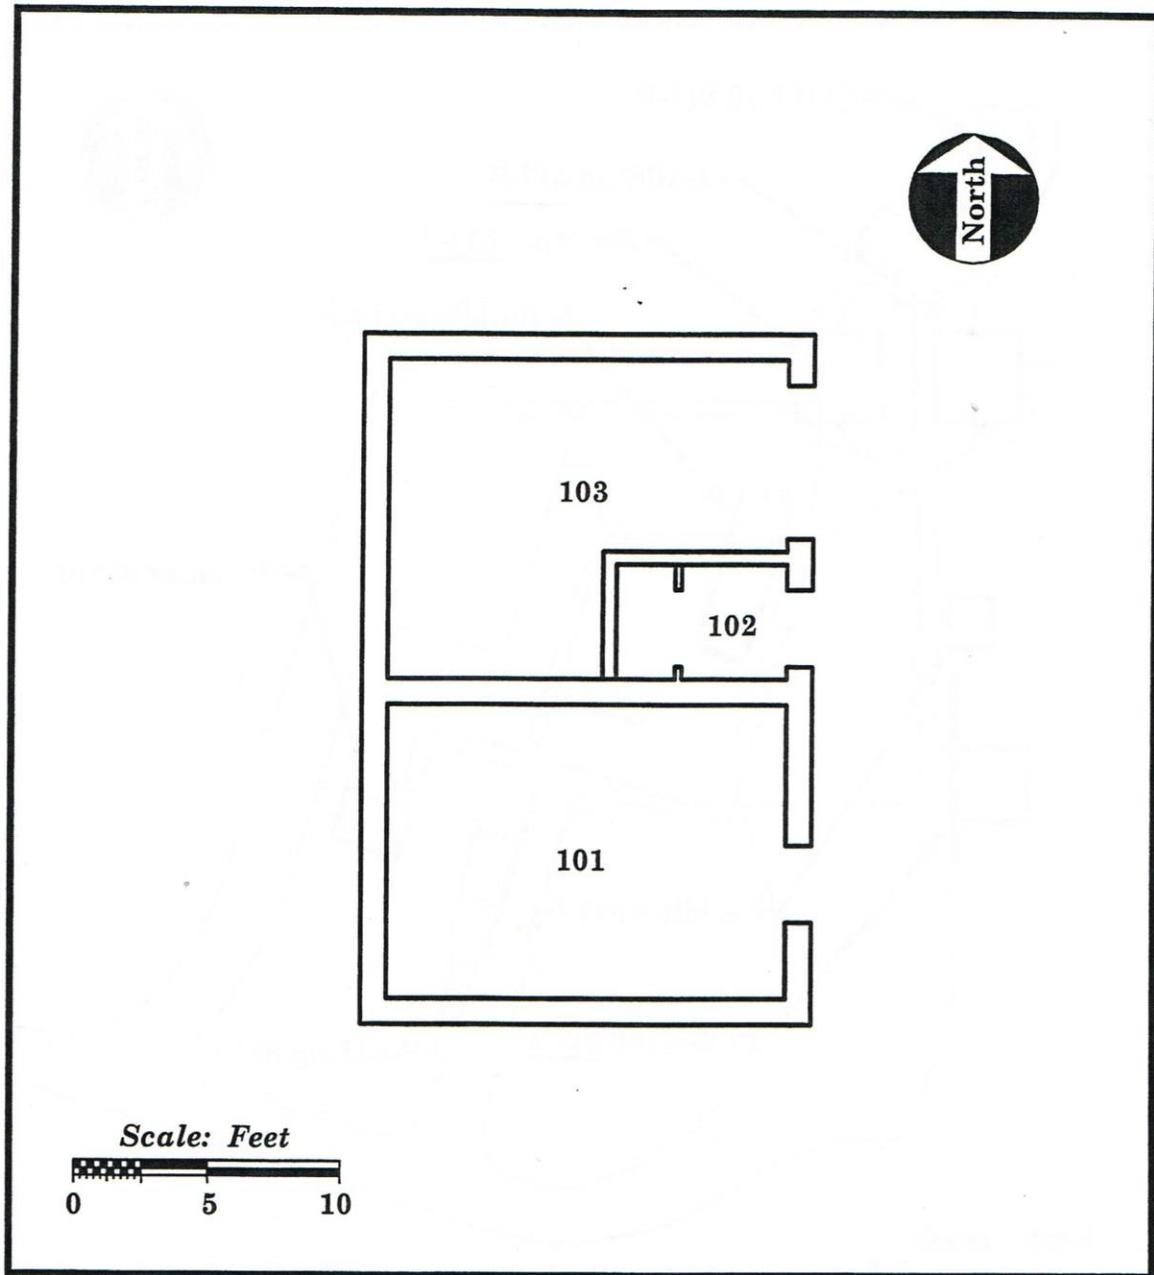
Facility Plot Plan - Building 817, 1997. LLNL Archives, (Figure A-10)
